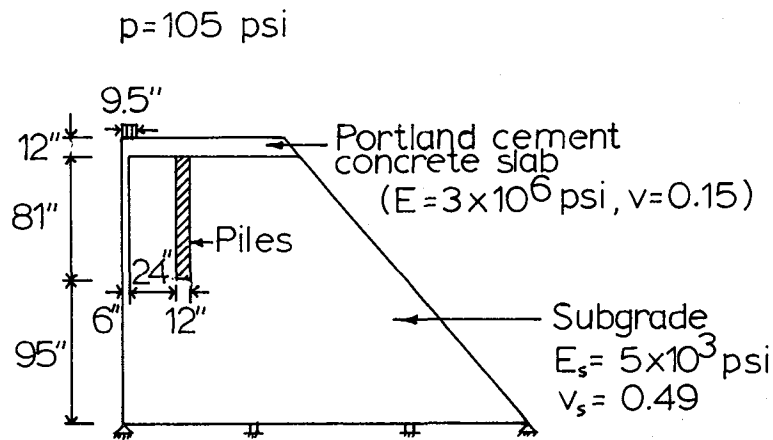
PILE-REINFORCED PAVEMENT MODELS
